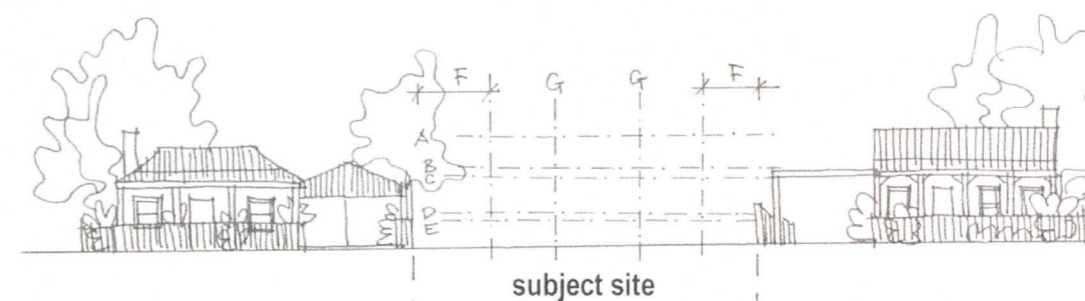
Site Analysis looking at the street patterning of adjacent heritage buildings.
